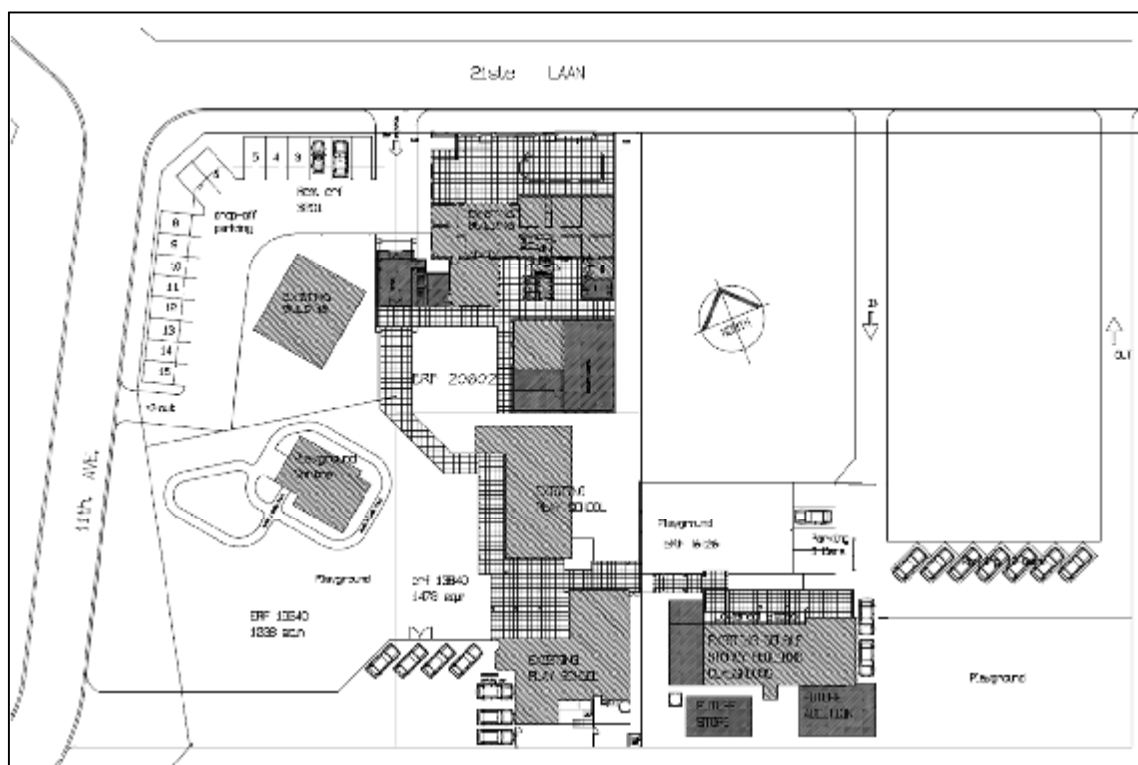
NEW SITE DEVELOPMENT PLAN
